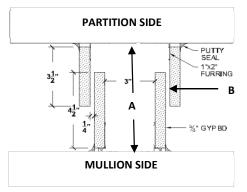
PLAN DIAGRAM OF STAGGERED PLATE SPECIMEN
